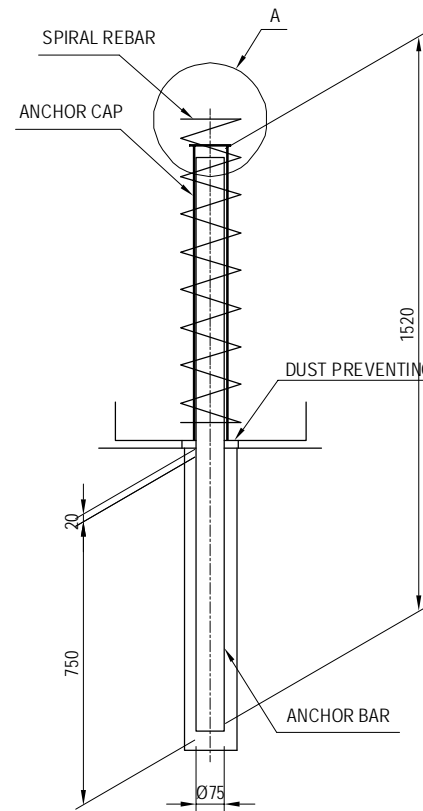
DETAIL OF BEARINGS FOR ON-RAMP (3) ANCHOR BAR (PO1)
